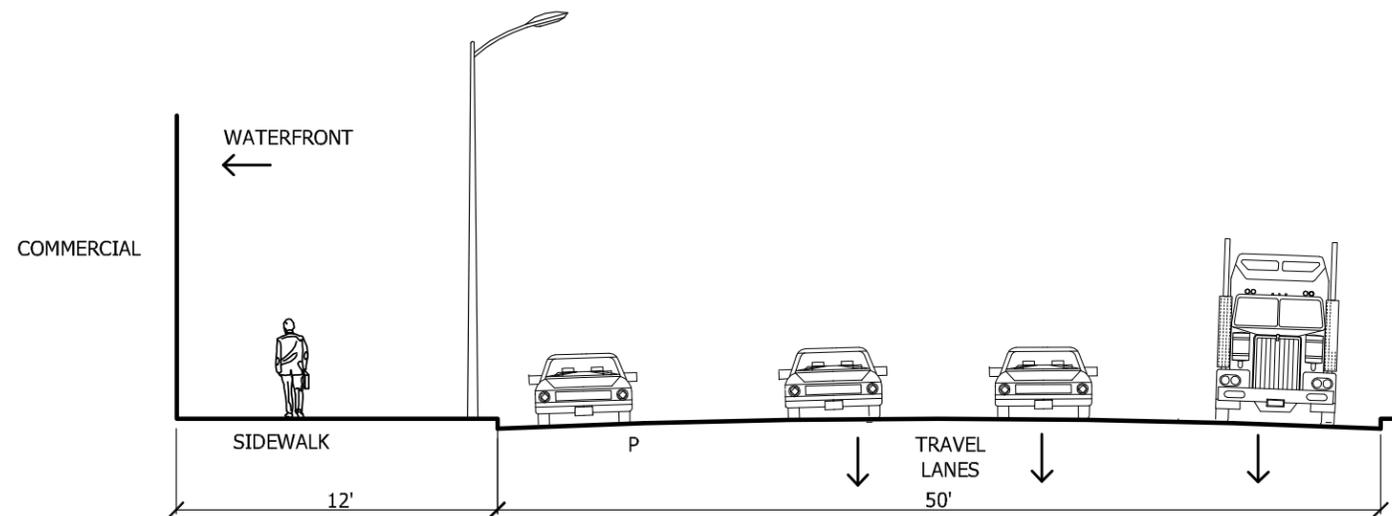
Existing configuration on Third Avenue between 21st Street and 27th Street
